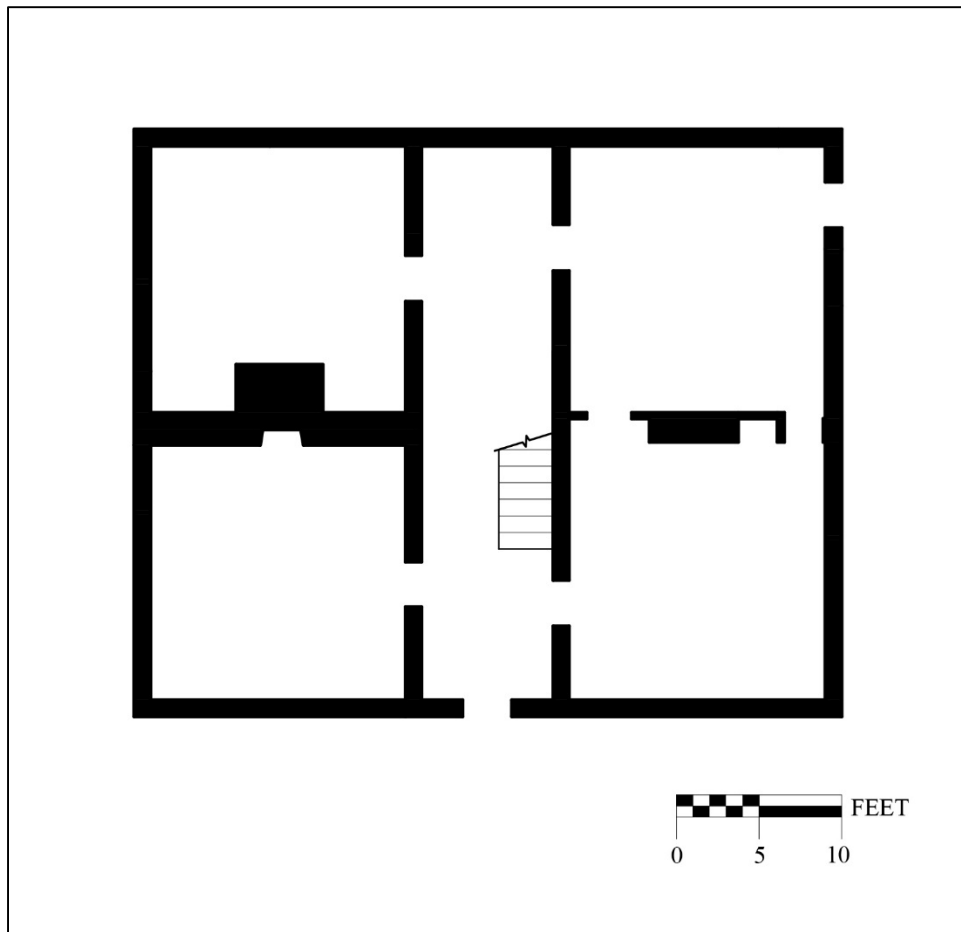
The Gasque House, first floor plan. Author, 2017.
